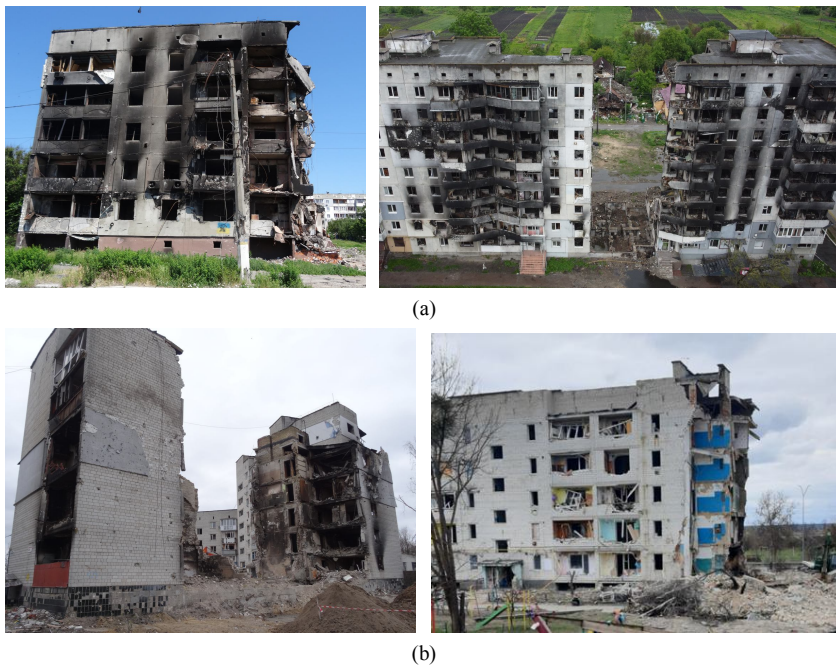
Destruction of multi-story buildings as a result of being hit by an aerial bomb: (a) – multi-story residential buildings made of prefabricated reinforced concrete panels; (b) – brick houses with ceilings made of prefab circular hollow reinforced concrete slabs
